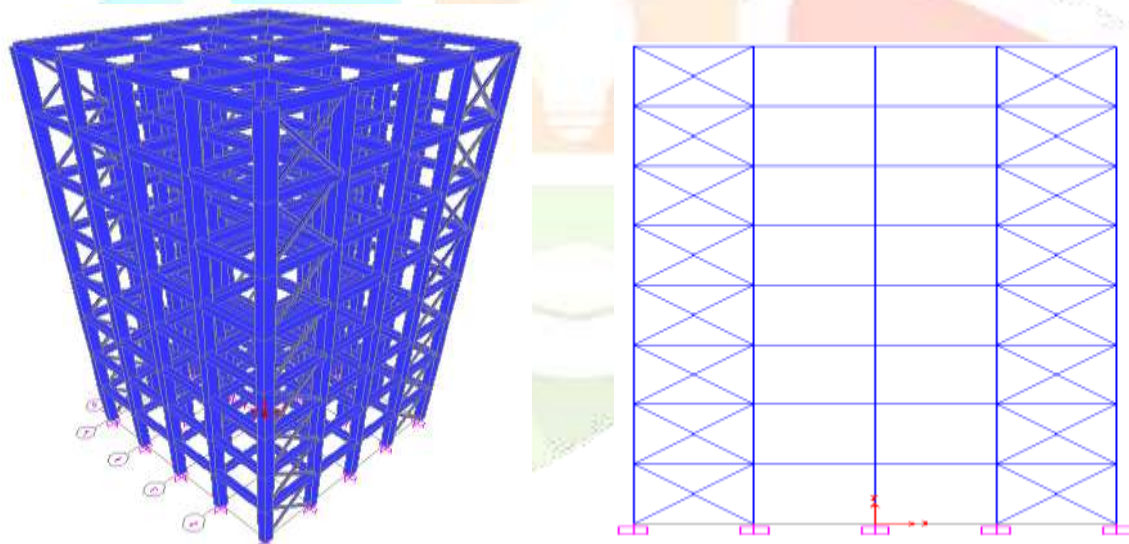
3-D and Elevation View of X Braced Frame Structure
